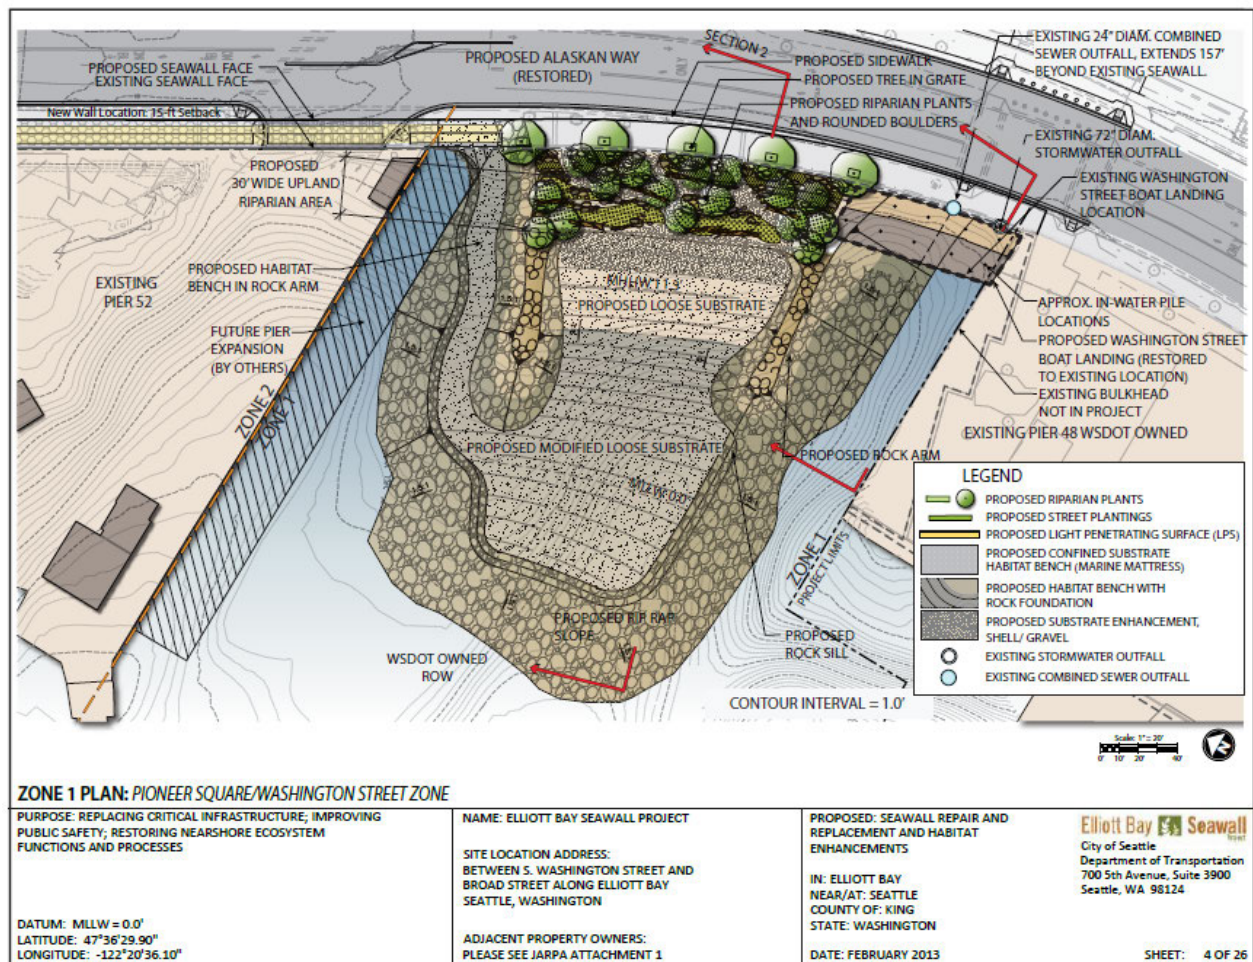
Proposed intertidal and shallow water bench located in Zone 1.
